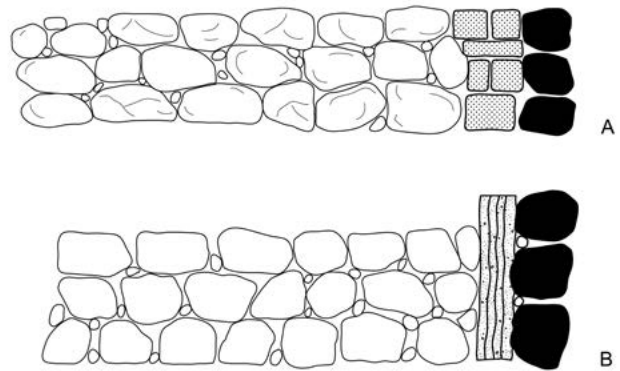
Wall, brick and plaster construction in Area B-west explaining gaps in abutting walls; (a) mudbrick join, (b) wall abutting mudplaster covering and not masonry.
